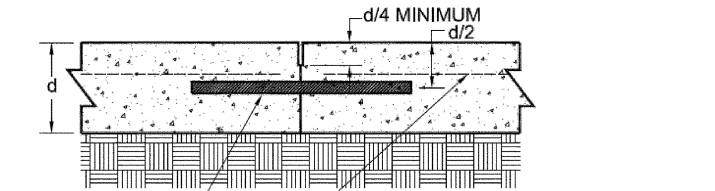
Example contraction joint details (longitudinal or transverse); refer to 3.7.1 for additional design information.
